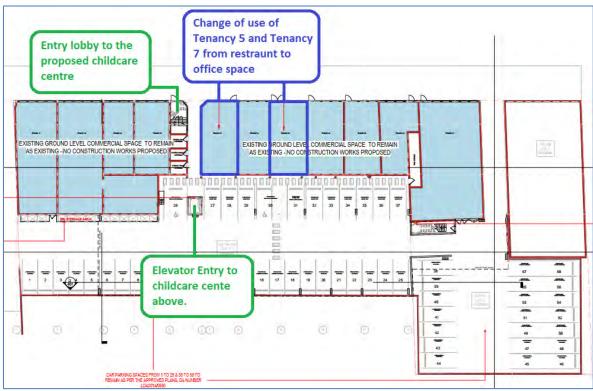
Proposed Ground Floor Plan indicating the location of the main entry point to the childcare centre, and the change of use of Tenancy 5 and Tenancy 7.
